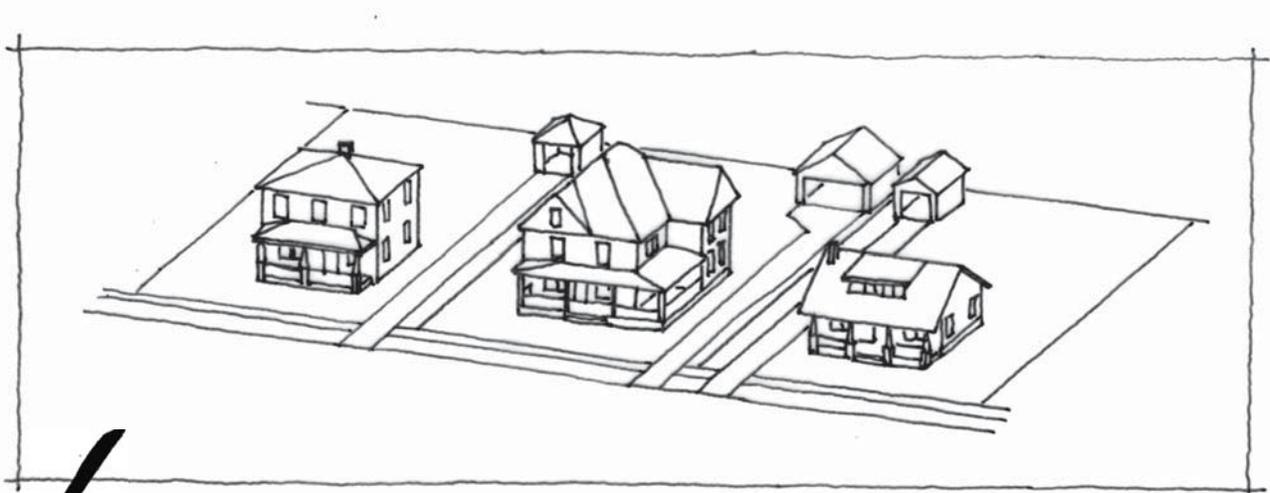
Design new buildings so that they reflect local historic building forms and shapes, whether gabled, cross-gabled, or hipped. Avoid forms such as elongated ranch styles and A-frames. *Source: JMA collection.
